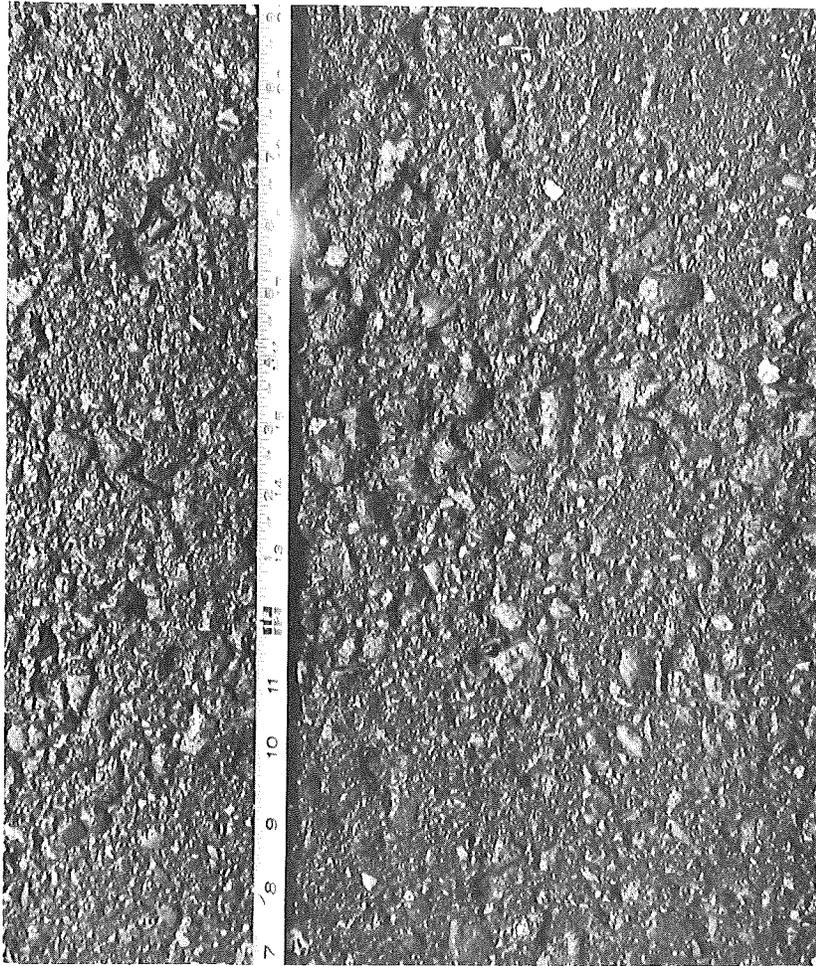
(above). Pavement surface on horizontal curve on M 203, Hancock (construction project M 31031-004).
